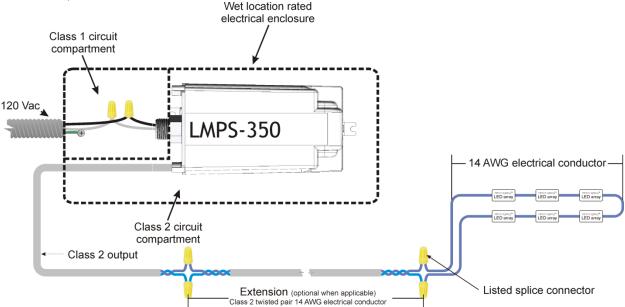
Electrical connections for installation in wet locations (twisted pair extension and LMPS-350 shown, others are similar)
